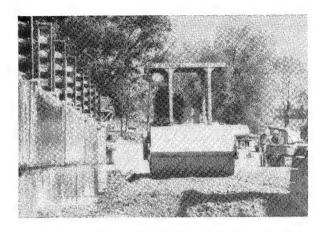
Rods used to anchor panels extend through bedding mixture into RCC, Winchester Dam (PEH Engineering)
